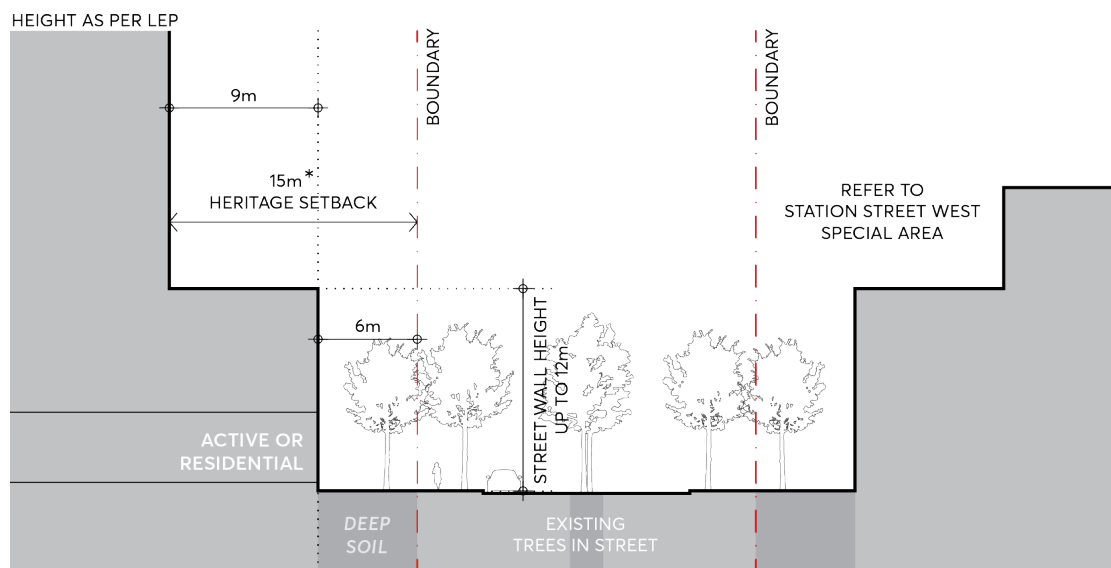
Dixon Street (Section B) Setbacks and Street Wall Height
